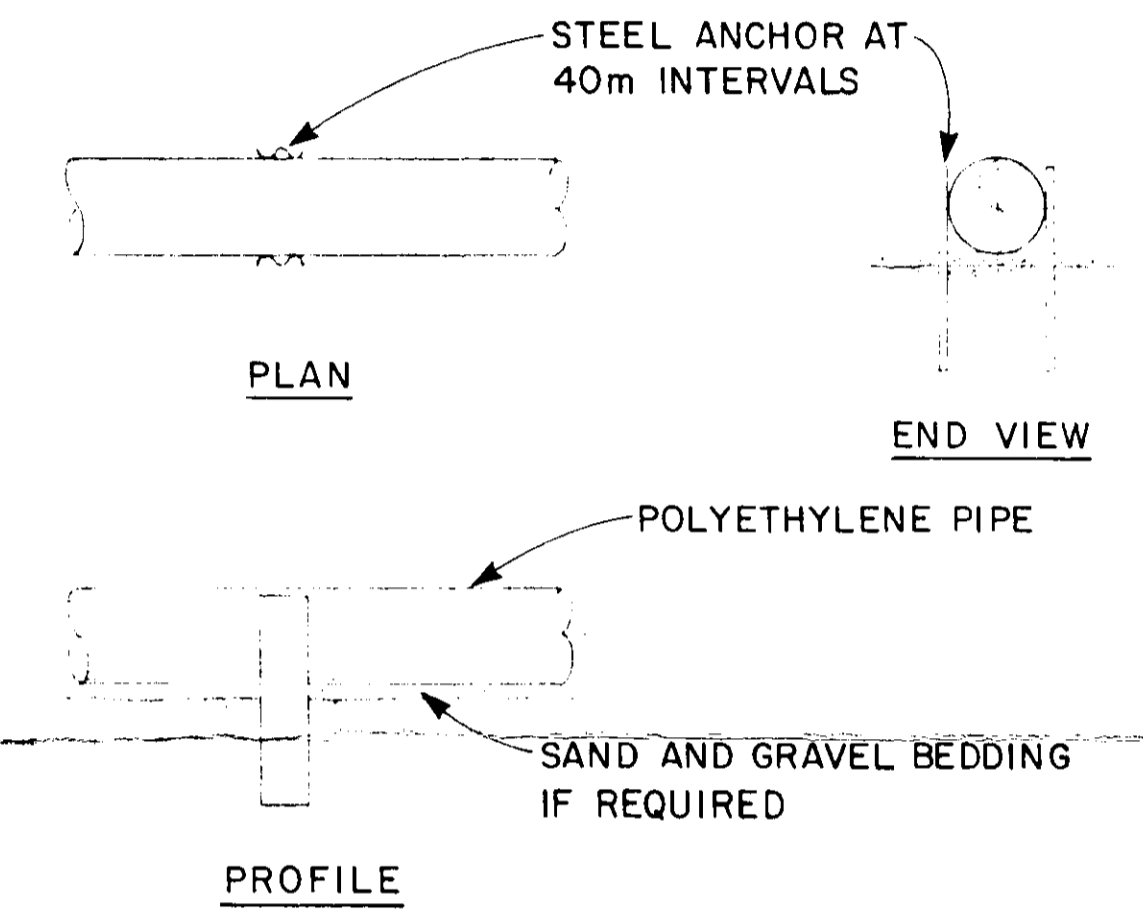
DETAIL OF POLYETHYLENE PIPE PLACEMENT ON PIT BENCH
